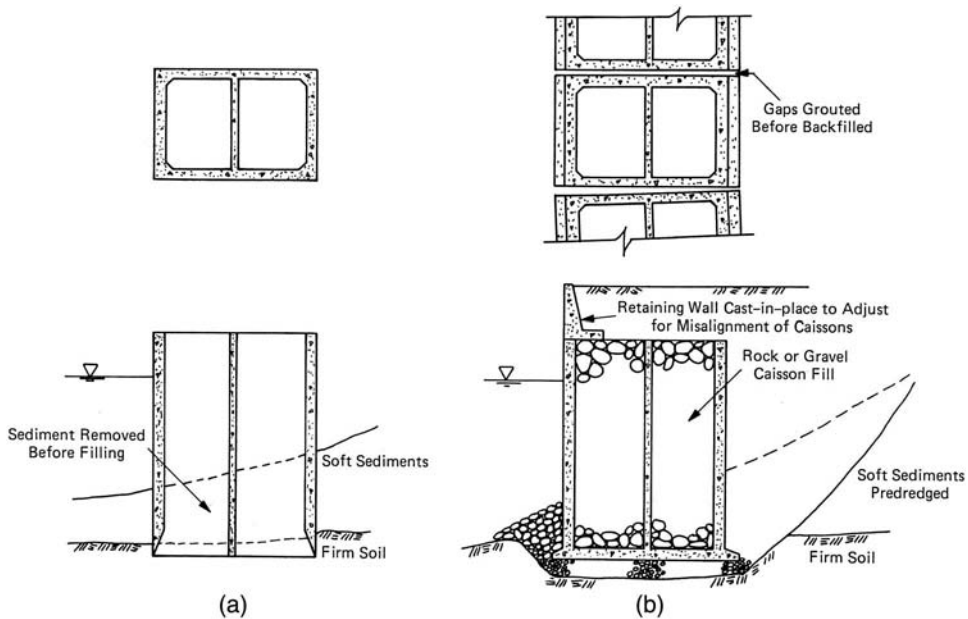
Concrete caissons: (a) open-bottom and (b) closed-bottom
